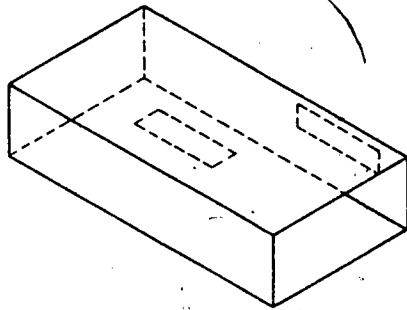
Sheet metal duct with take-off holes cut in the bottom and back.
